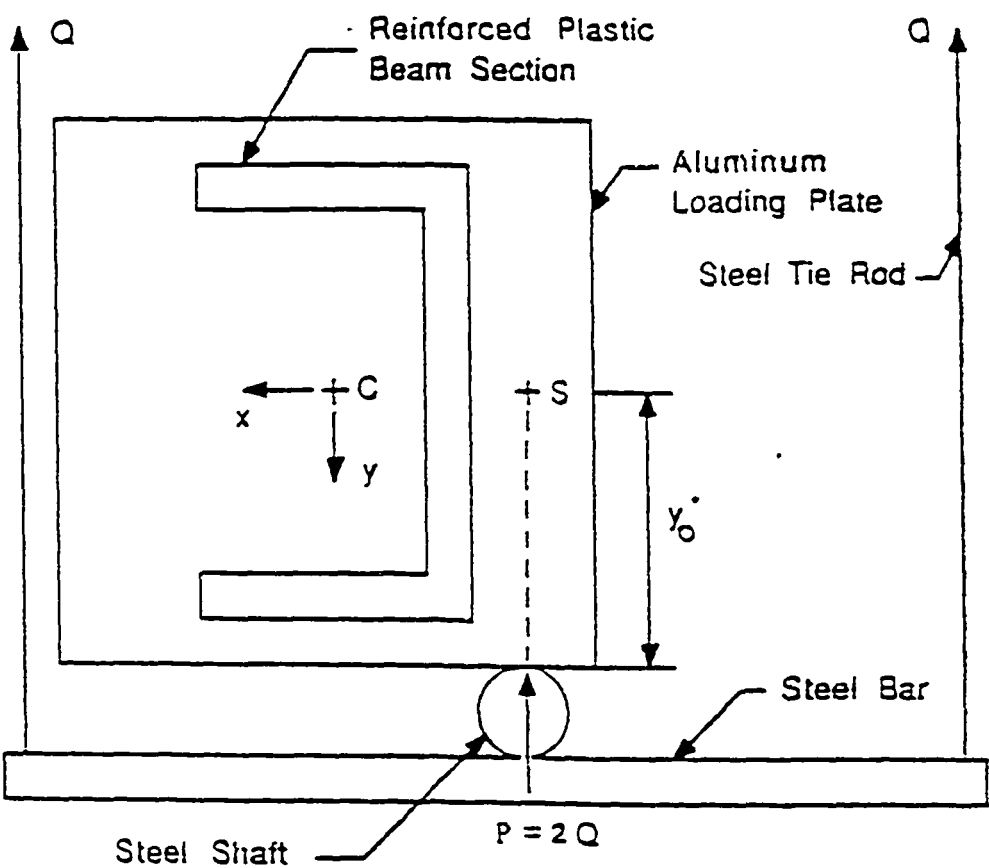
Cross-sectional schematic view at load application points (F and G) for channel section beam
